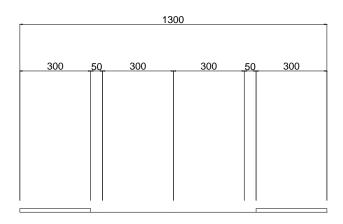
Typical Cross Section of Kebina/ Mutebi Roads
